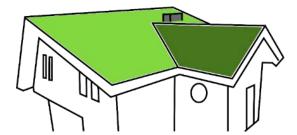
Constructed wet roof (source: ILPOE 2019)
